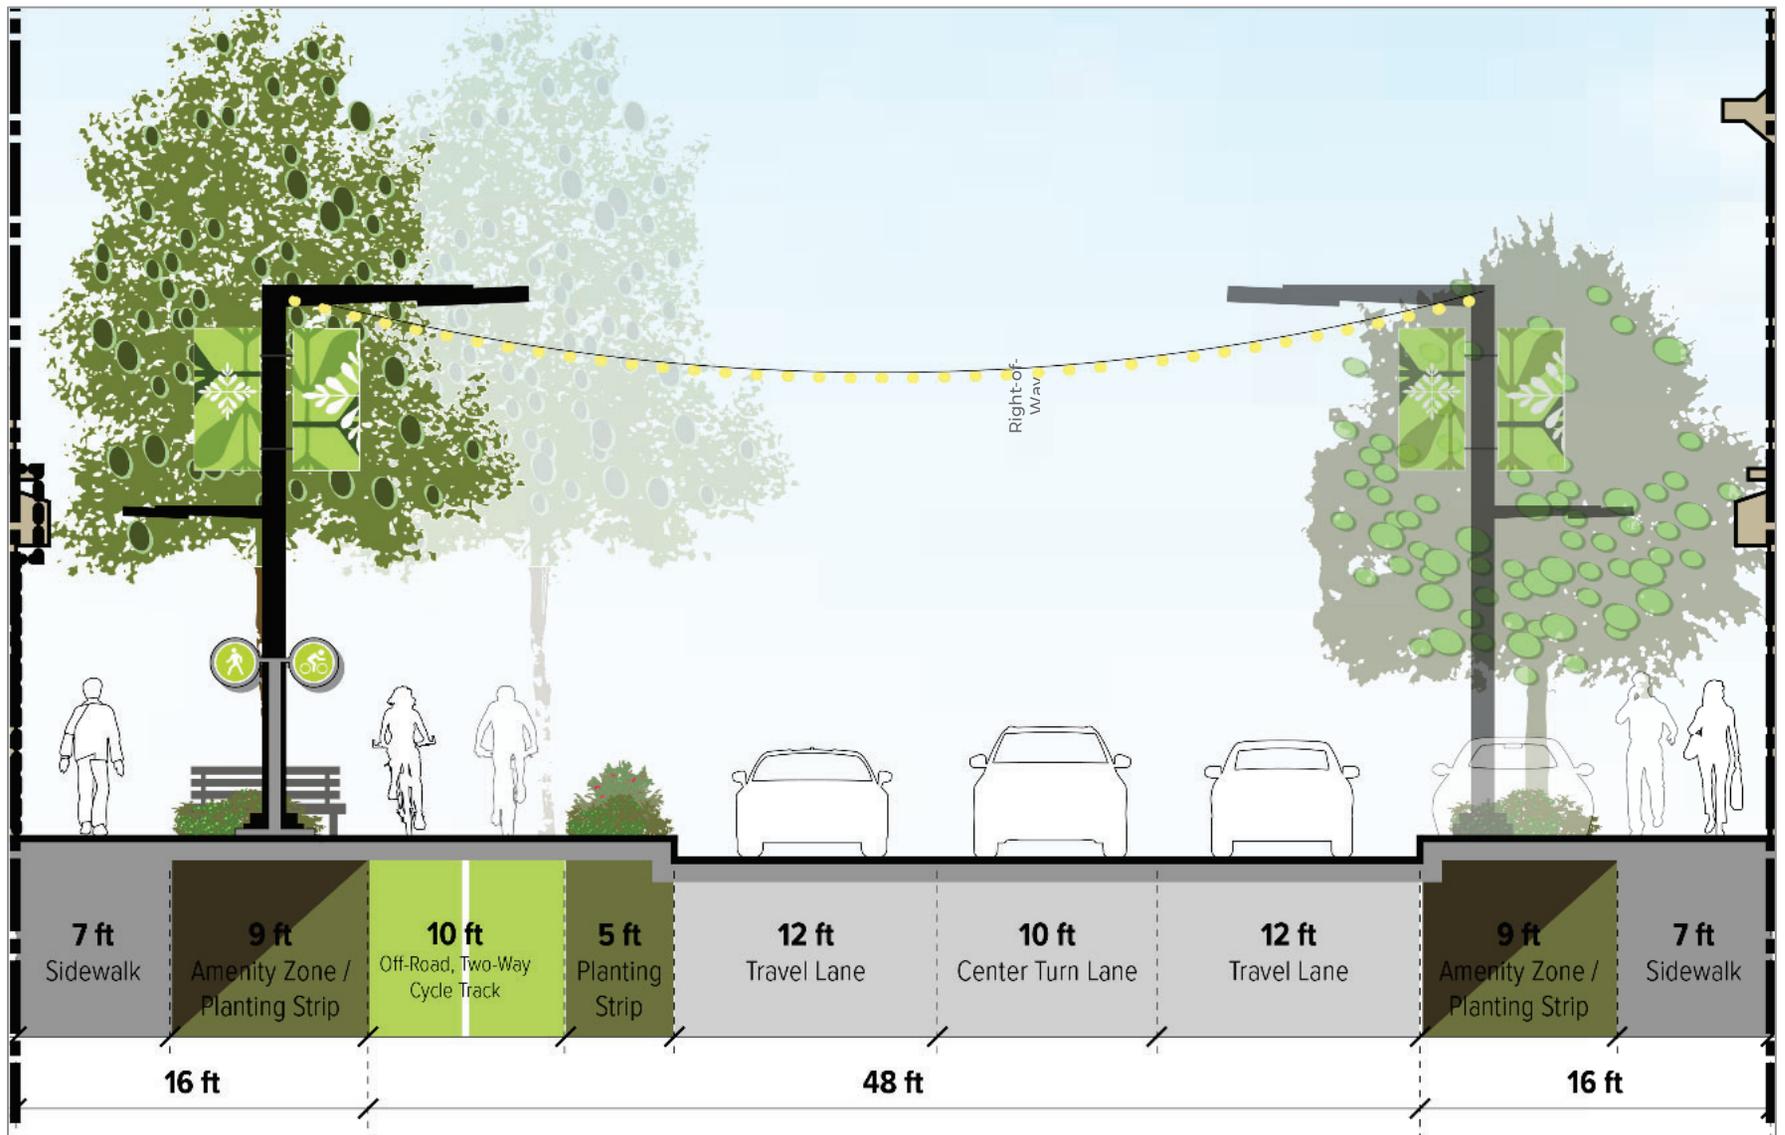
Proposed cross-section of Lee Road between Scottsdale & Lomond, looking north
